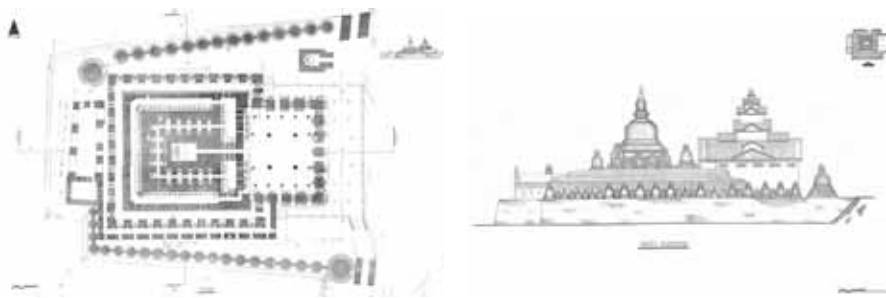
Ground floor plan and elevation of Shit-Thaung temple
